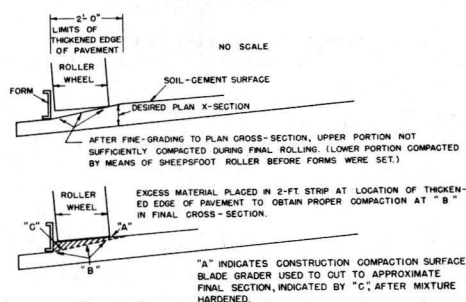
Procedure used for compacting cement-treated subgrade at location of thickened pavement edge.
